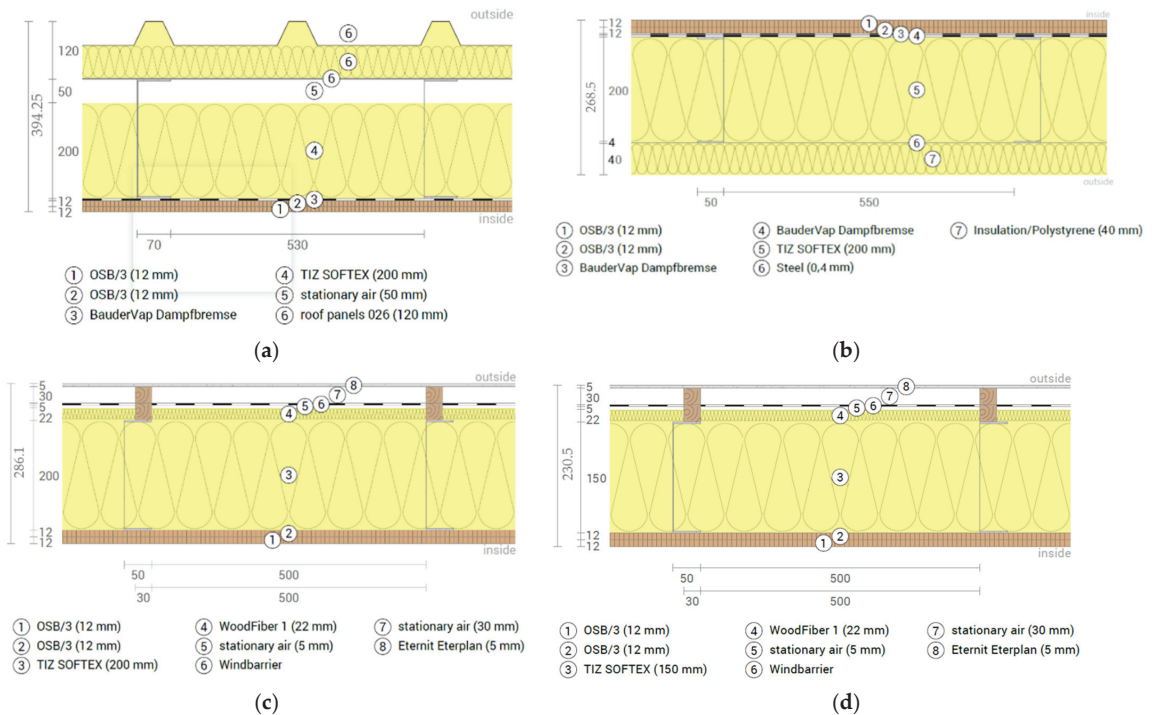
LSF construction elements cross section: (a) roof; (b) ground floor above crawl space; (c) exterior wall north; (d) exterior wall—east and west. Reprinted from [22].
